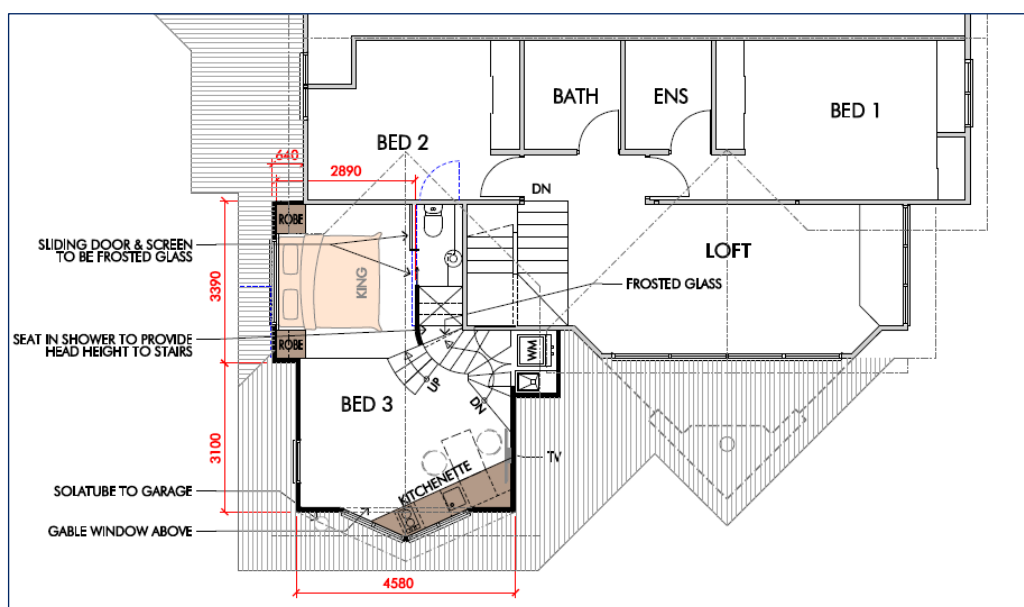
| Proposed first floor plan (Source: Applicant's documentation)
